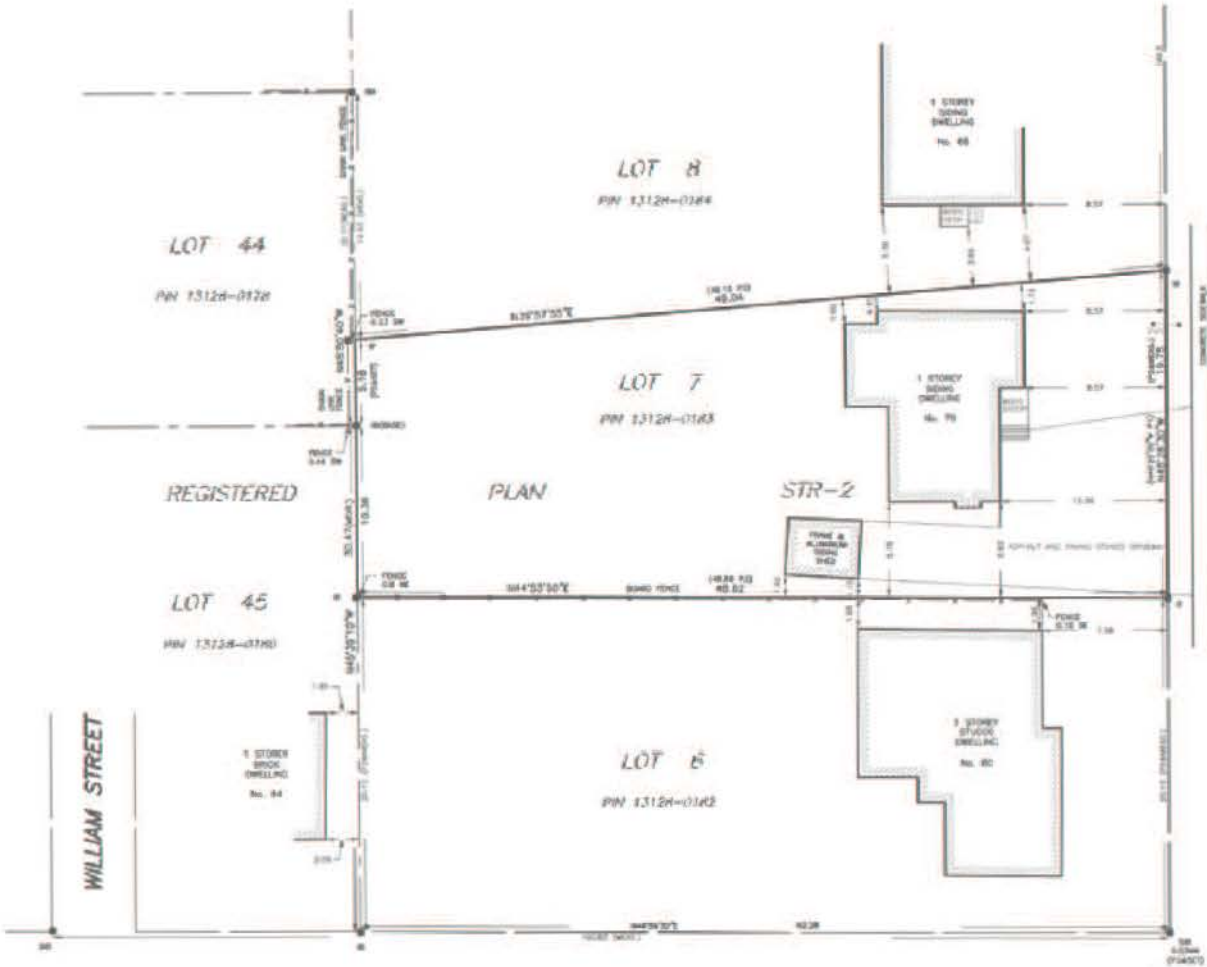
Detail of Plan 43R-36881, a survey of Lot 7, Plan STR-2. (Image from the Peel County Land Registry Office.)
